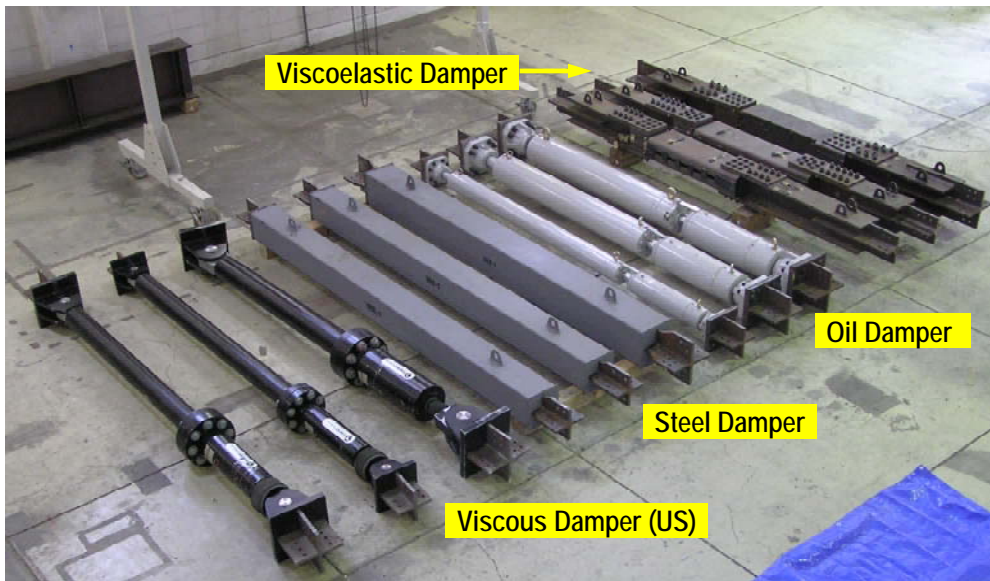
Full-scale Dampers Tested Prior to Building Experiments
